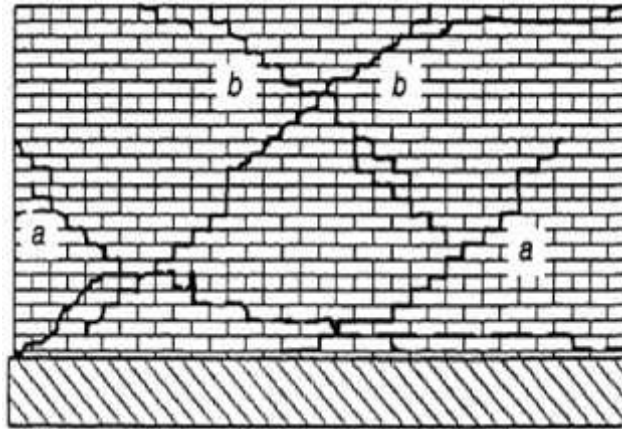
Shear Crack Pattern for Tested Wall (Abram, 1992)
